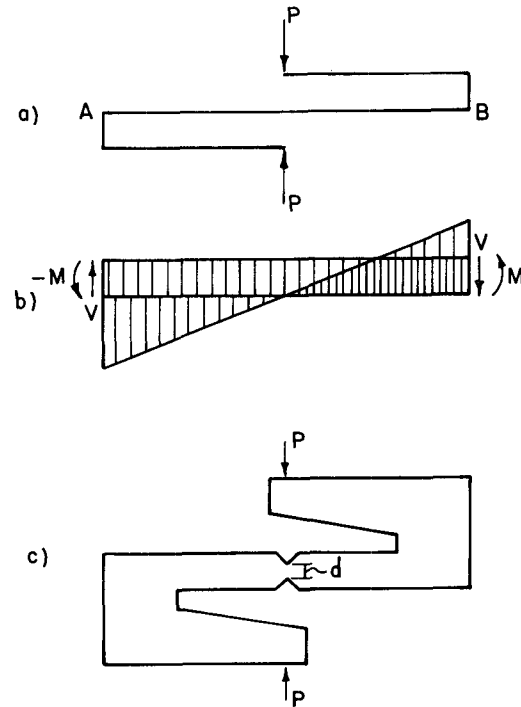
S-shaped shear specimen: (a) loading scheme; (b) shear and moment diagrams for central beam portion of the specimen; and (c) specimen configuration including V-notches to localize failure at the point of zero moment.
